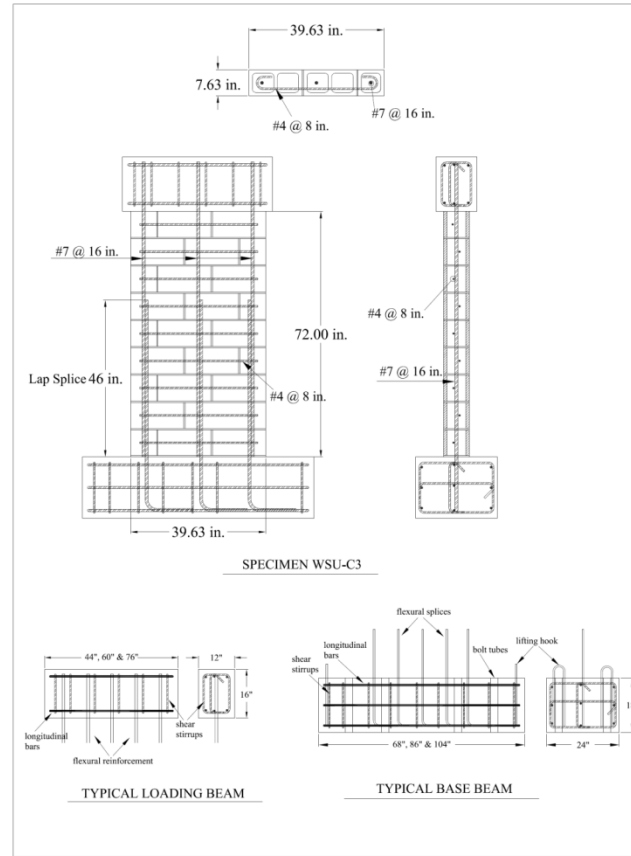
Reinforced masonry wall C3 tested by Kapoi (2012)
